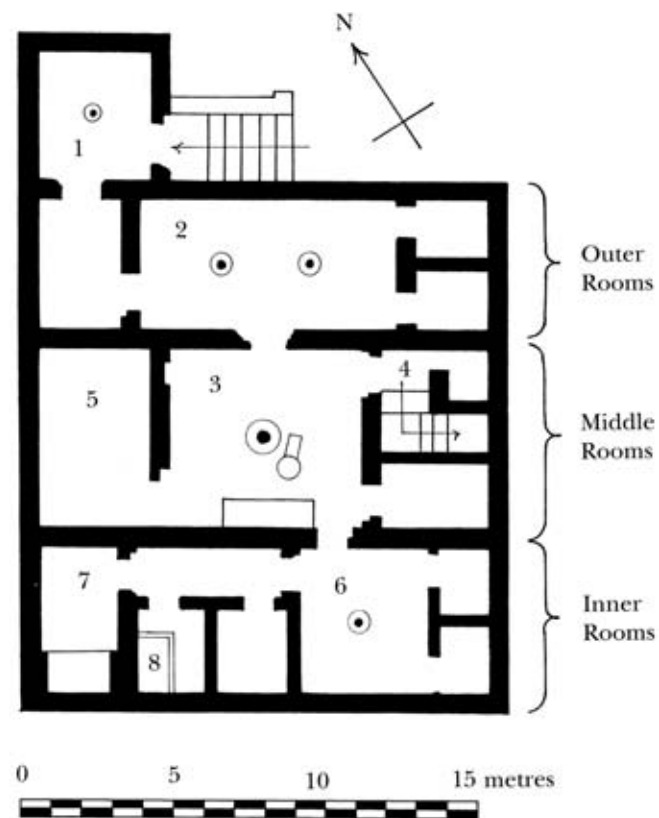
Plan of a large Amarna house, M47.4. After BORCHARDT and RICKE 1980, pl. 17. The most important rooms are numbered. 1: porch; 2: outer hall; 3: central hall; 4: stair; 5: second broad hall (or west hall); 6: inner hall; 7: bedroom; 8: bathroom
